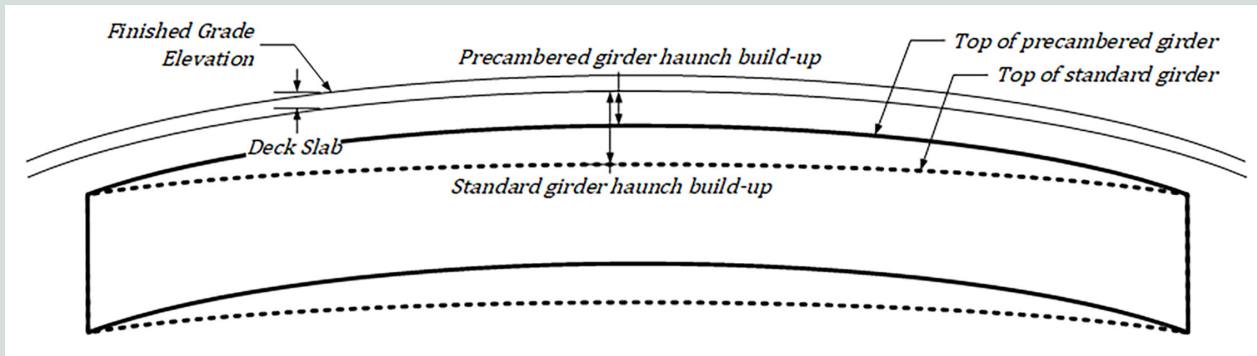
Comparison of slab haunch buildup for standard and preambered girders.
